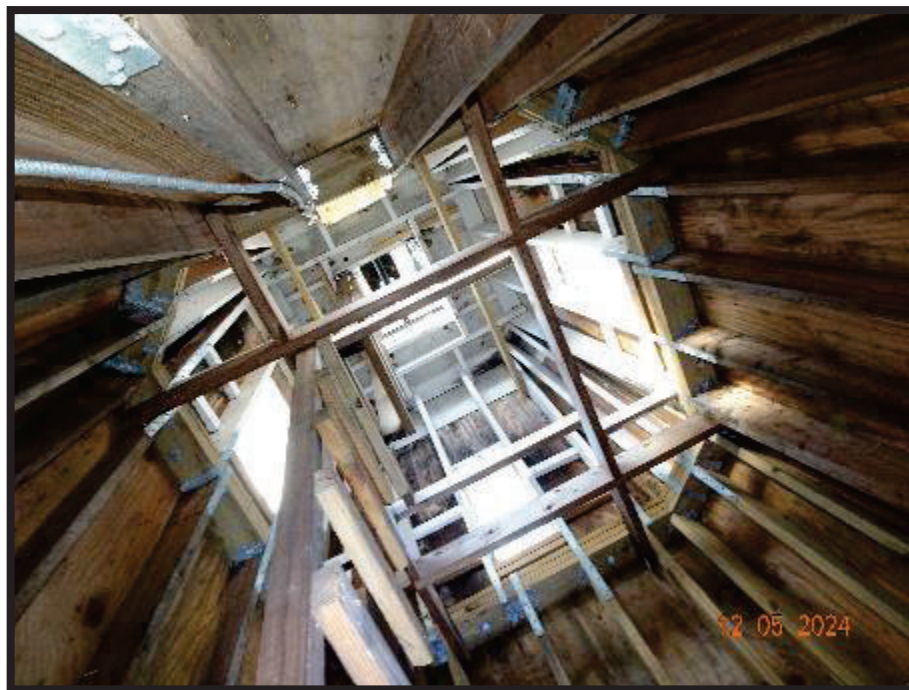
View of interior surfaces of framed wall of Lighthouse Tower. Note black substance stains along the face of plywood and some of the wood framing.
